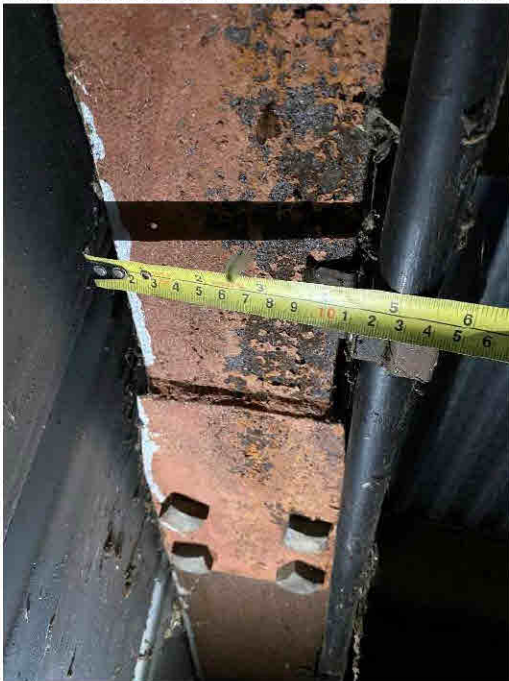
Typical Portal Frame Column, Note Tapering Profile.
